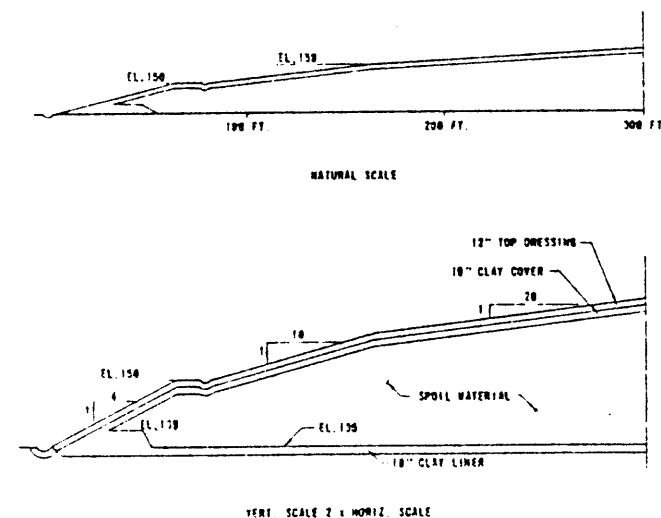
TYPICAL SECTIONS — MOREAU SITE
